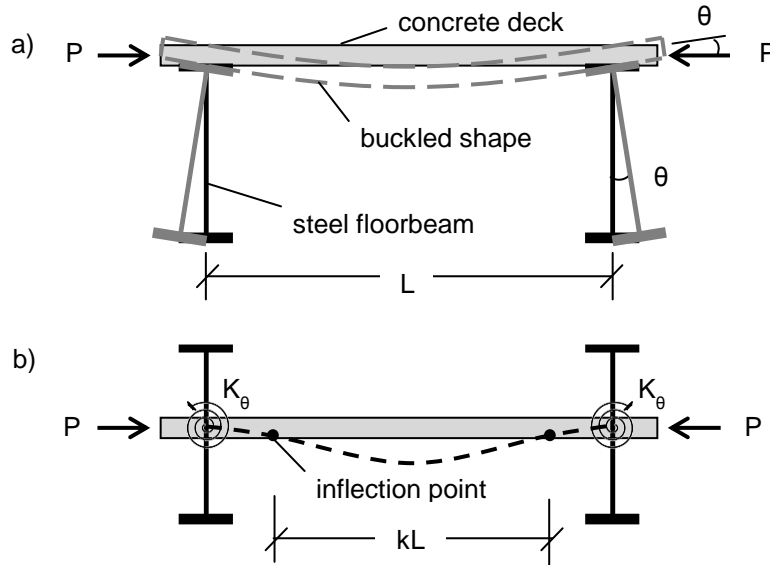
Deck slab instability: a) buckled shape; b) idealization with deck slab at the floorbeam centroid.
